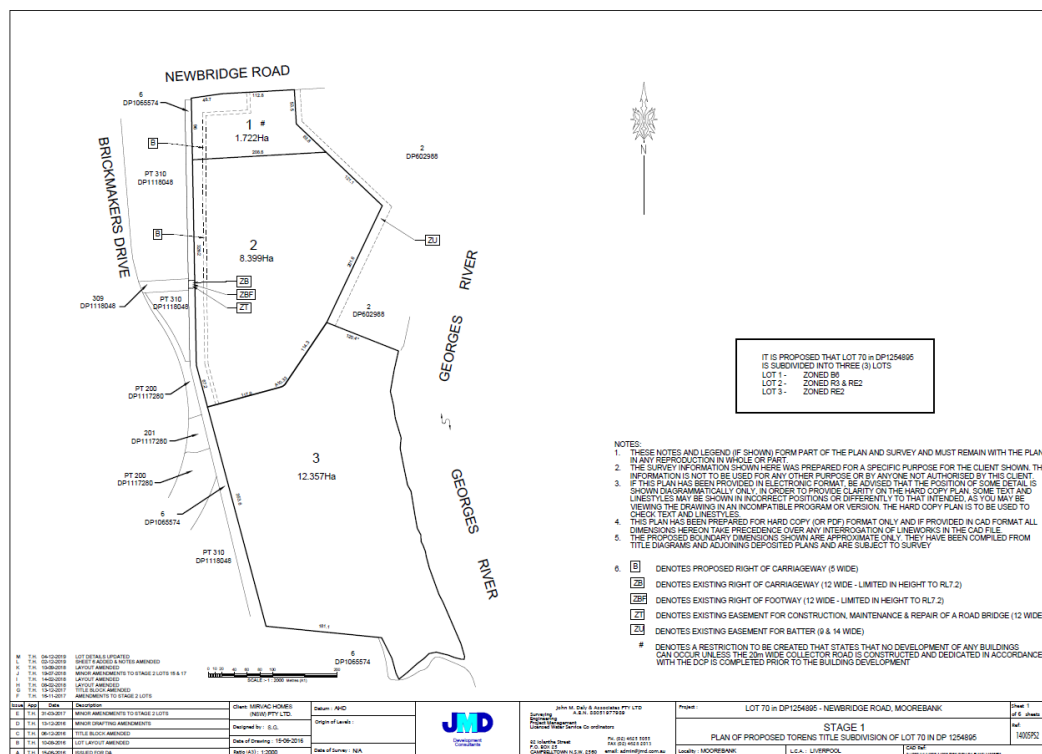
Three (3) lot subdivision at 146 Newbridge Road, Moorebank
